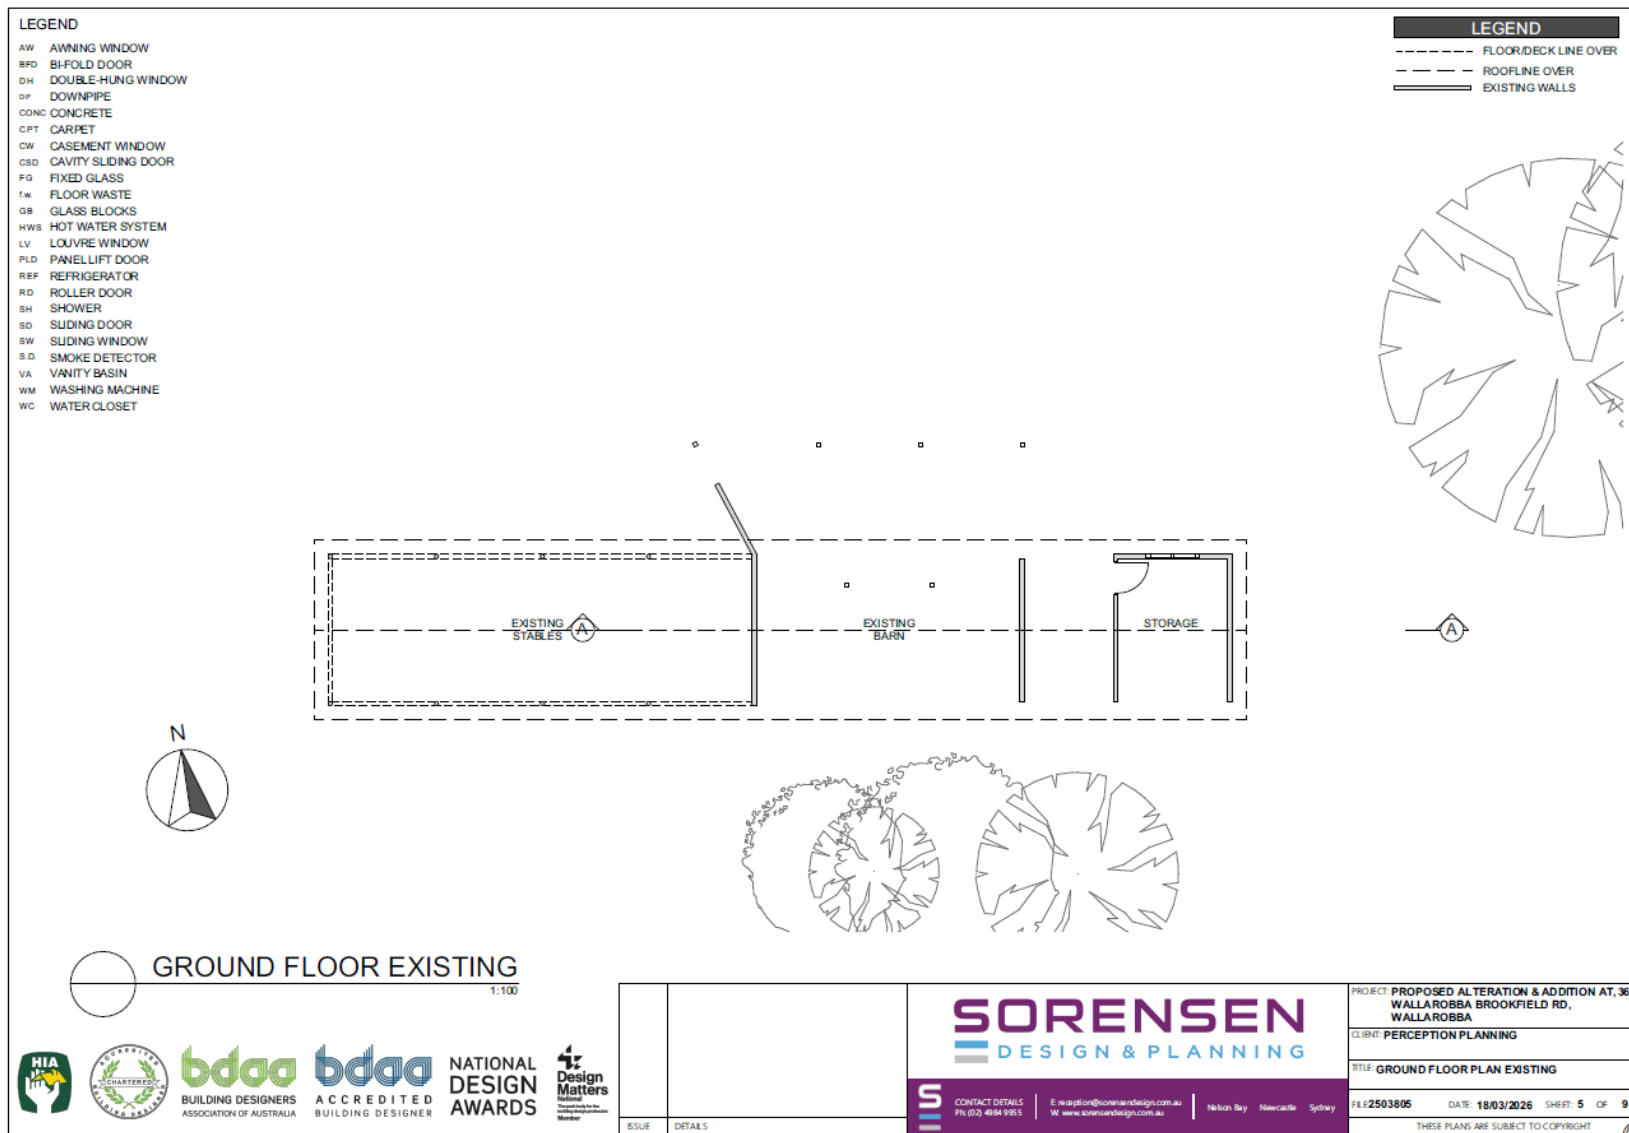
Existing Floorplan (Sorensen Design, 2026)
